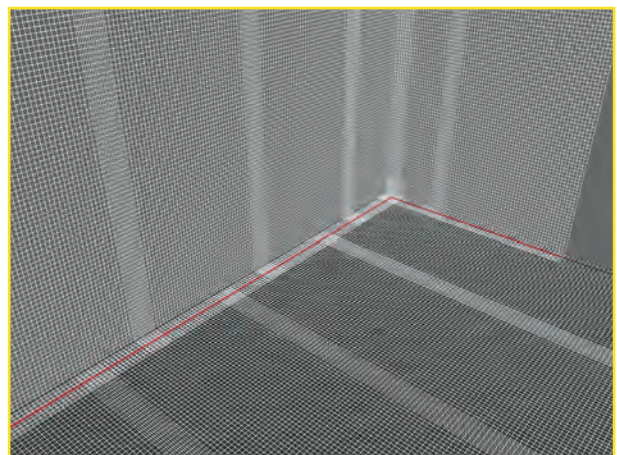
Connecting the overlapping parts. Grounding on the floor with EEB
